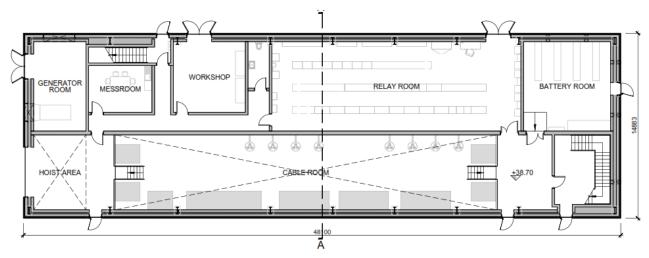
Extract from Reddy Architecture + Urbanism Ground Floor Plan for the GIS Building
